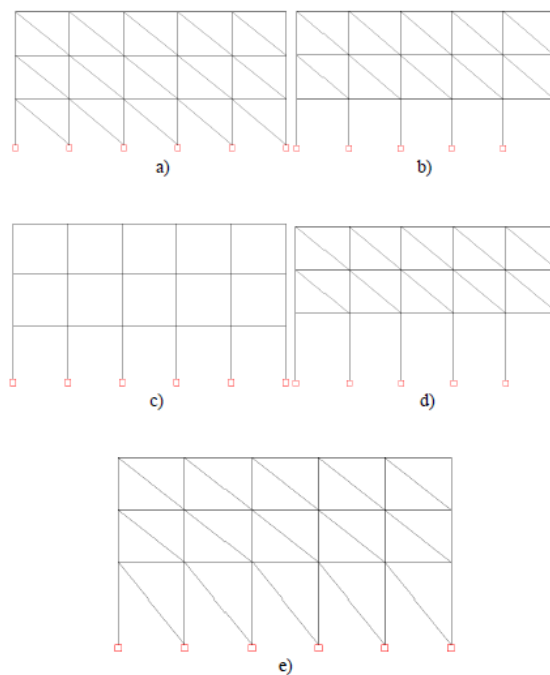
Elevation view of building models a) Ref, b) SSW, c) RefWW, d) SS-H-W, e) SS-H
